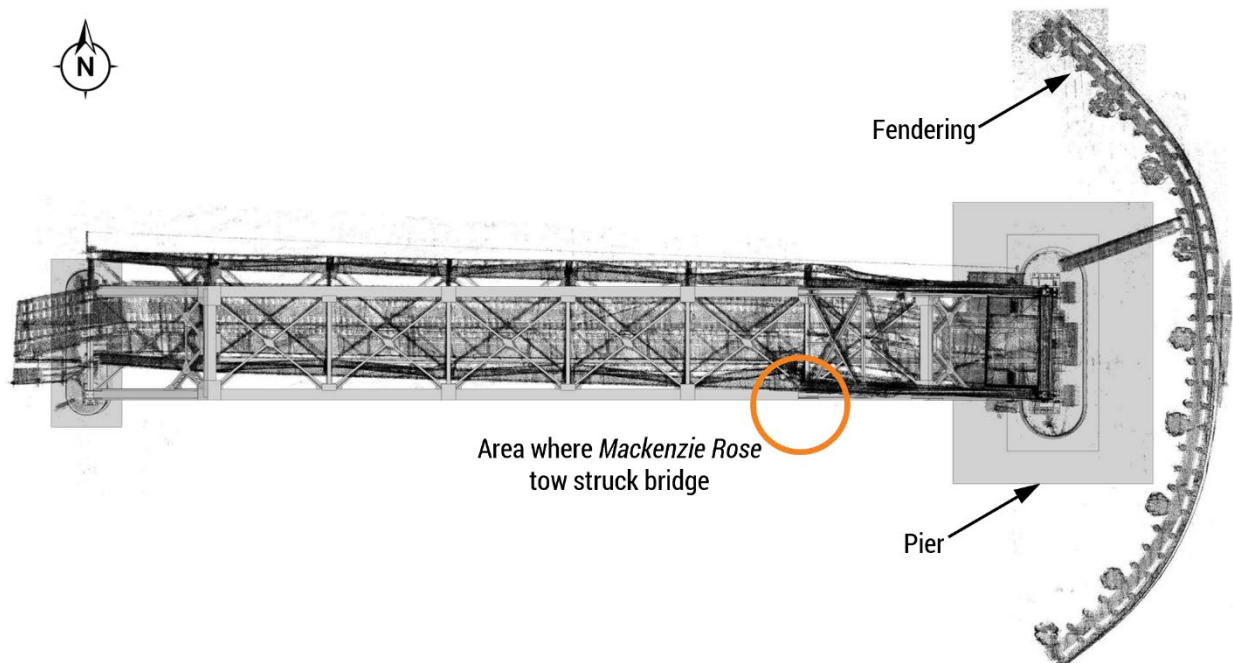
LiDAR image showing western span's misalignment compared to the designed alignment. The area where the tow struck the bridge is circled. (Background source: Norfolk and Portsmouth Belt Line Railroad Company)
